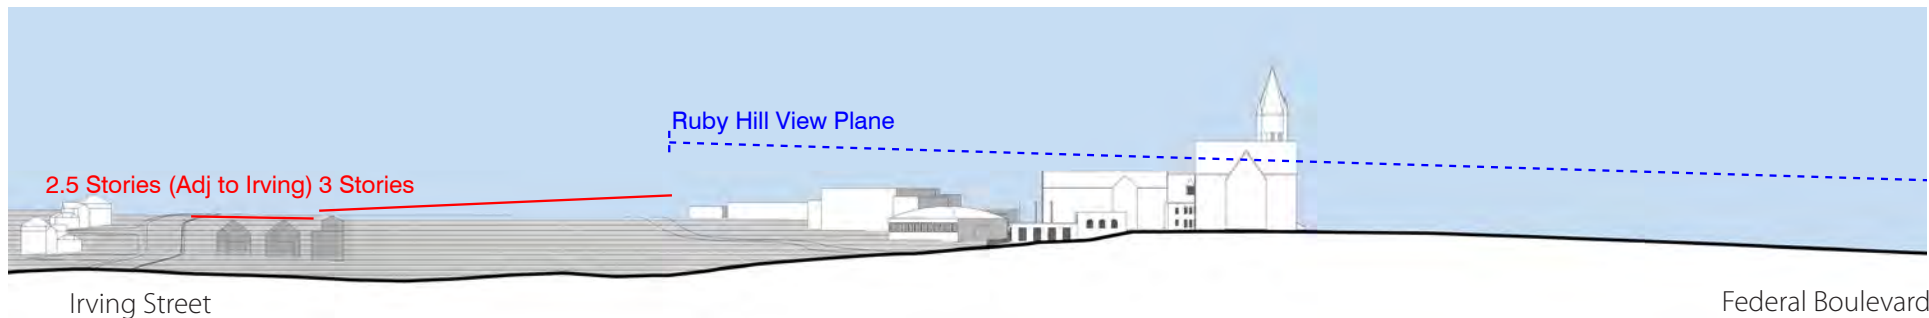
East/west cross-section of Loretto Heights campus, showing building heights and Ruby Hill Park View Plane
